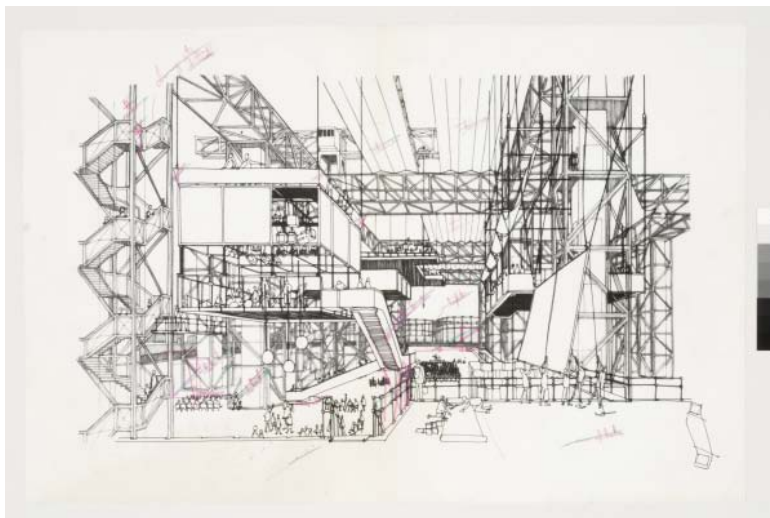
Open Buildings. "Fun Palace." *Open Buildings: Buildings*, 2011. <http://openbuildings.com/buildings/fun-palace-profile-39265#!buildings-media/5>.
